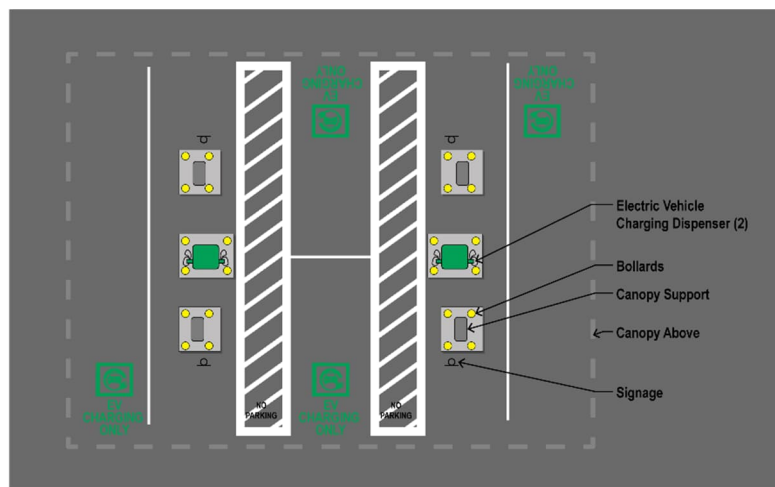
Example EV Site Layout with 2 Pull Through Spaces
